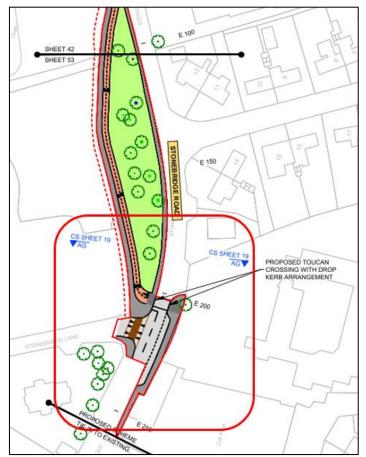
Extract from General Arrangement Drawings at Stonebridge Road (Sheet 53)
